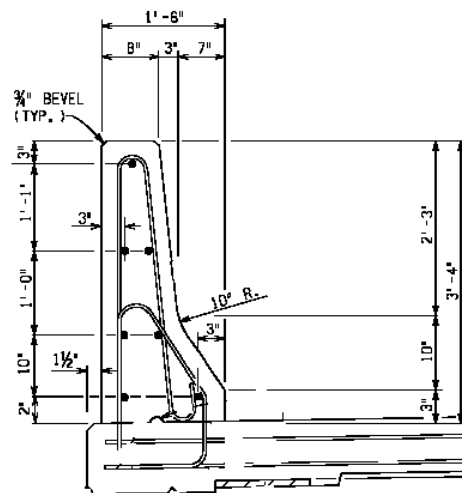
New Jersey Type 4 barrier (Note: 1 in. = 25.4 mm)
